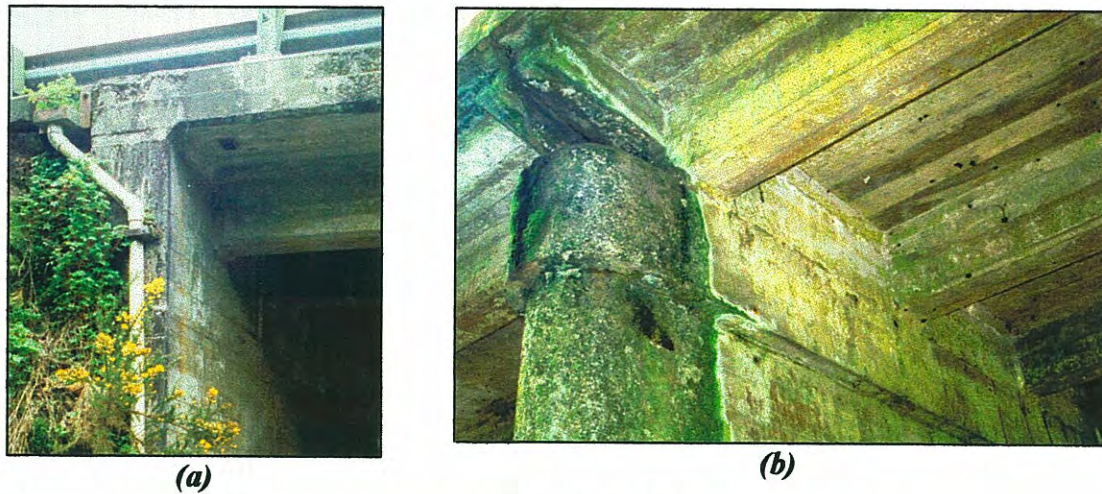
(a) Abutment detail and (b) Pier detail of Tuakopai Bridge.
